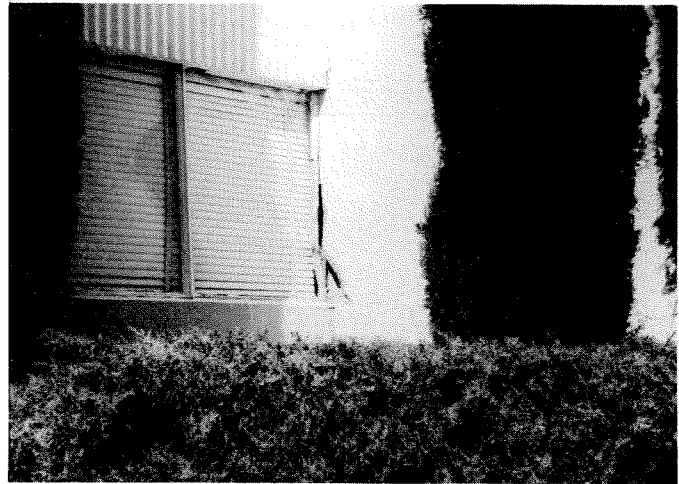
Repaired section of building shown in Figure 3.130. Sections of the columns have been recast and cracks filled with epoxy.
